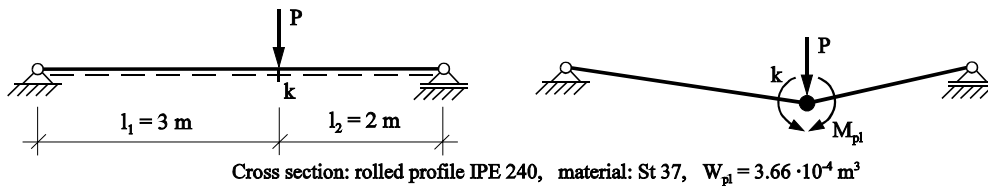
Steel girder; static system with loading; governing failure mechanism
